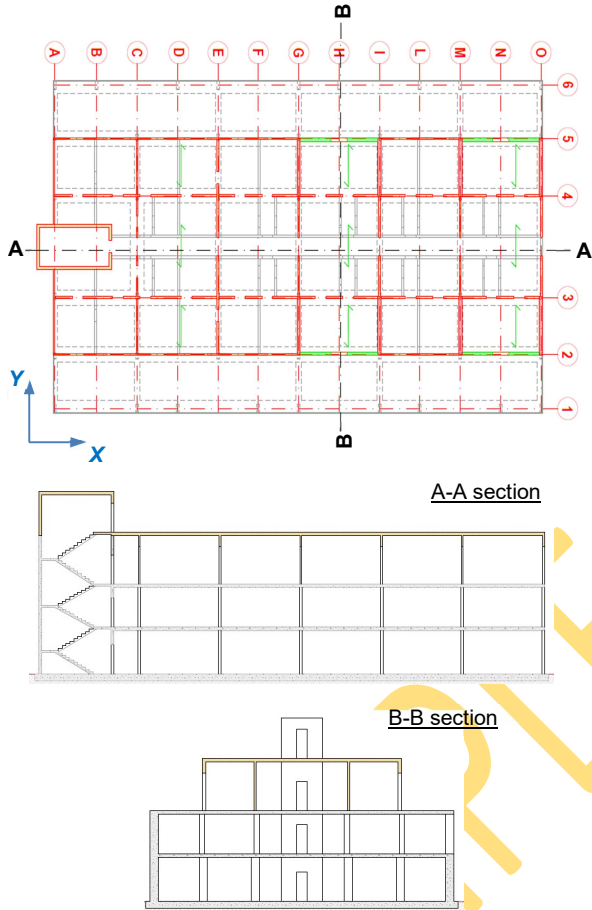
Top Storey Structural Plan, and Longitudinal and Transversal Cross Sections Including the LFT Top Addition
